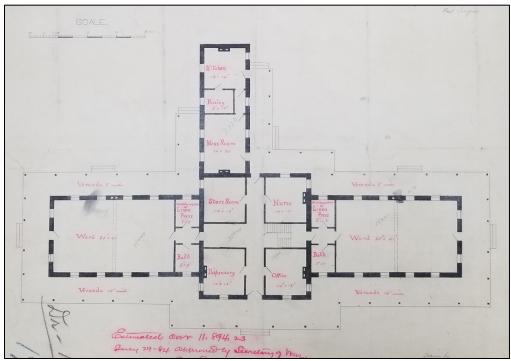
Plan of Post Hospital (41408) on the north side of the parade ground, 1884.
